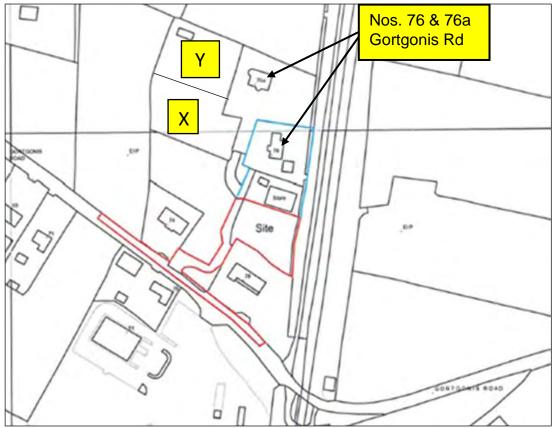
Shows red line around site LA09/2020/1309/O proposed for 1 dwelling, current site being recommend as approval for 2 dwellings marked X; site approved for 1 dwelling under LA09/2018/0349/O & LA09/2020/1296/RM marked Y; and two existing dwellings served via the lane nos. 76 & 76a Gortgonis Rd.
